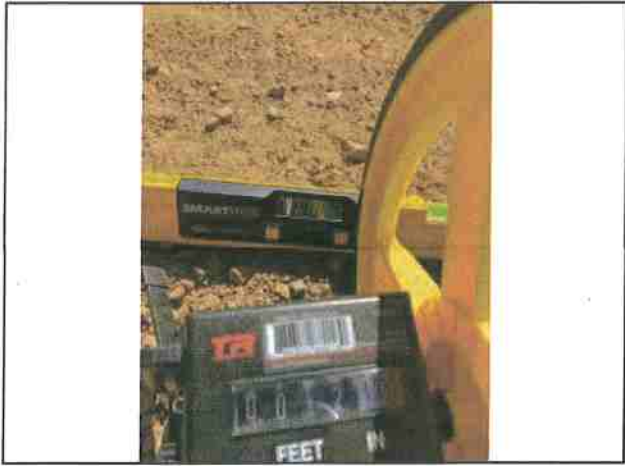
Private Access Rd Slope 24.0% Width 12'1"
